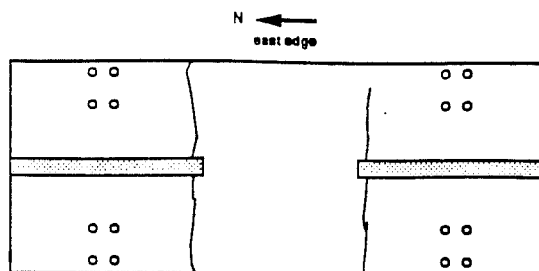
Sp. 2a: Progression of Cracking of Top Face of Second Floor Slab at Load Point 135
